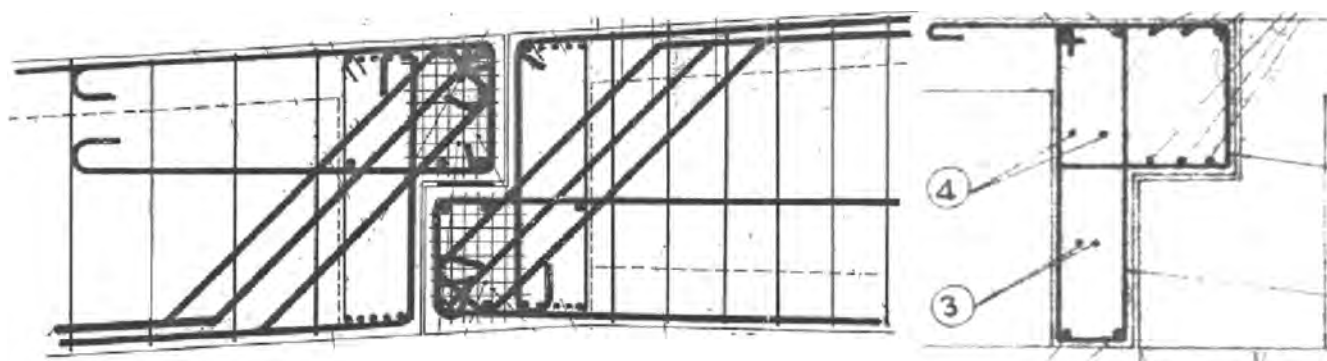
Gerber saddle and transverse beams (original drawings of typical concrete bridge girders in the 1960s)
